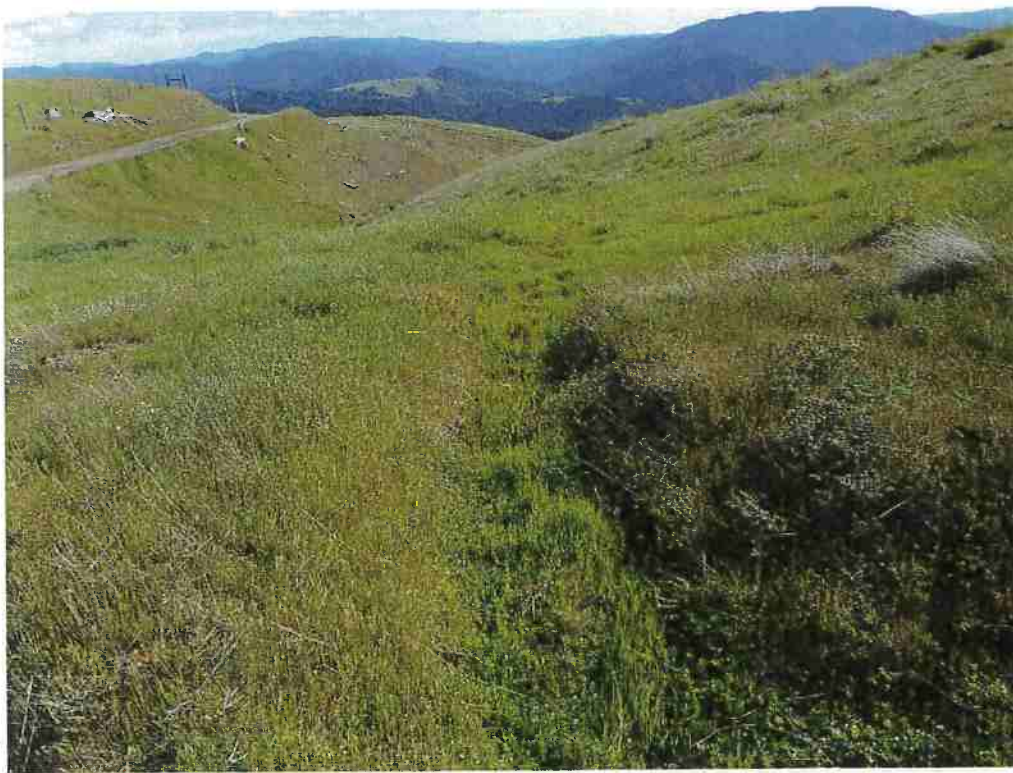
RP 3. Lead-out ditch discharging on stable, vegetated hillside. Photo taken facing west.
